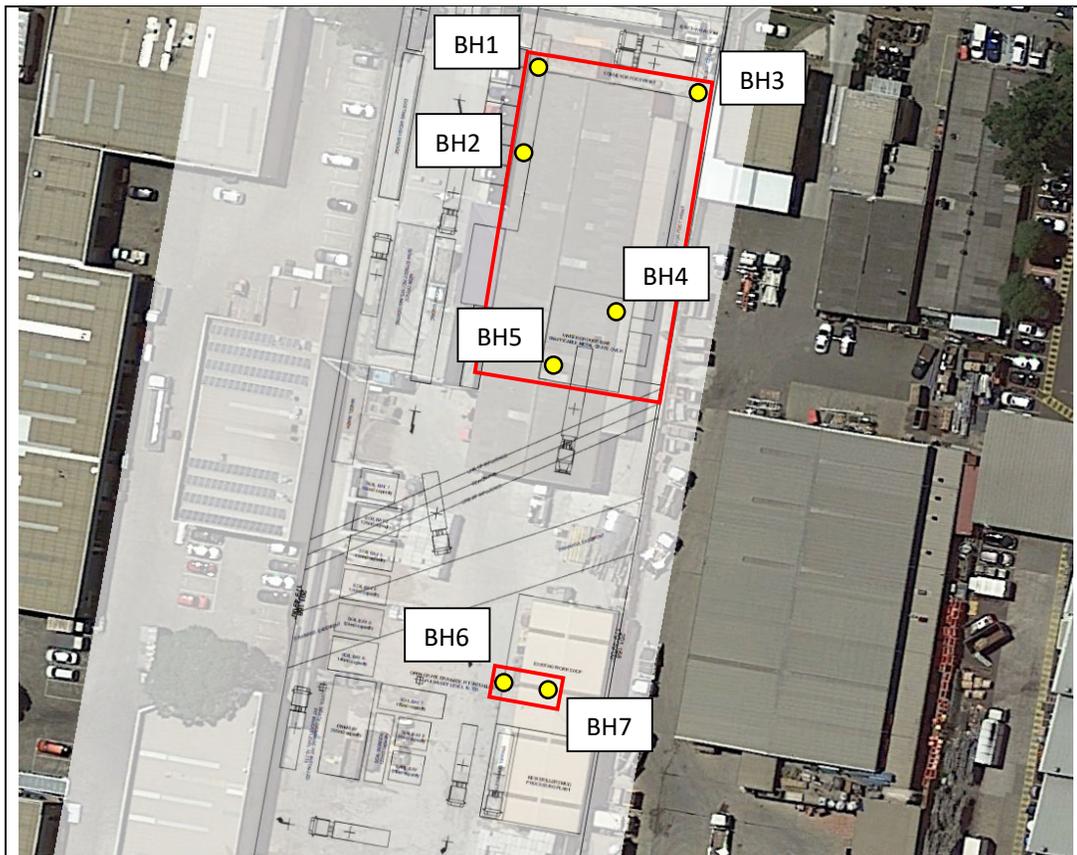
Aerial view of the site plan showing excavation zones and planned structure locations
